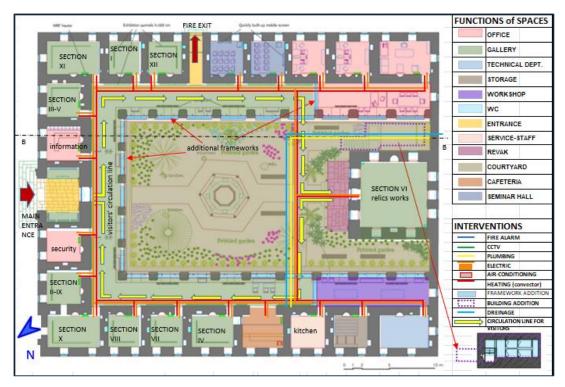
Plan showing the refunctioning of the spaces and interventions of Beyazıt Medrese; underground toilets in the courtyard, at the right bottom according to the applied restoration interior design plan by Paralel 41 Architecture in 2010 (archive of Yılmaz Yapı, the contractor)
